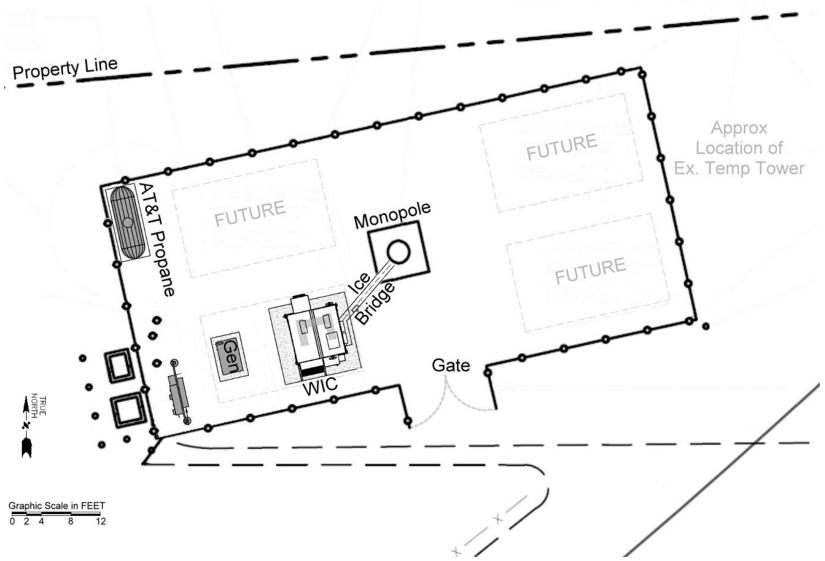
Layout of the Proposed Permanent Tower (showing location of the Temporary Tower).
